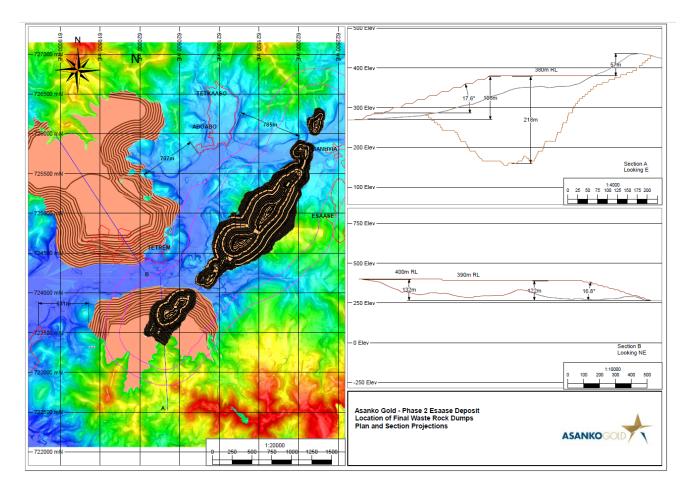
Final Esaase Pit and WRD Layout (source: DRA 2017)
